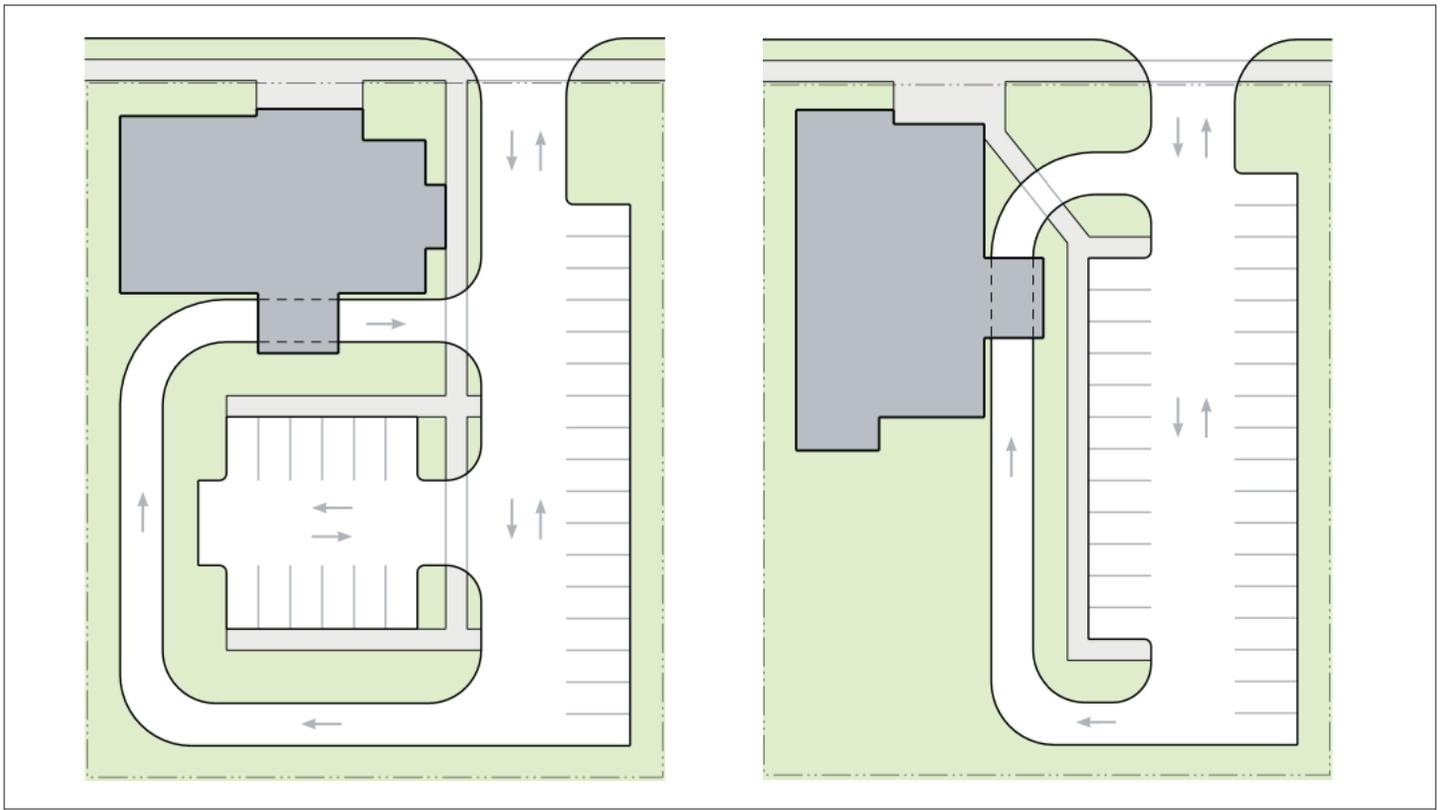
Drive-Through Facilities with Rear and Side Pick-up Windows
